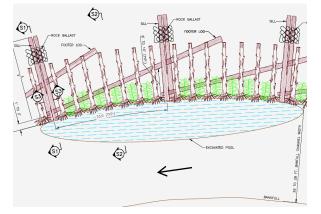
Two cells of a toe wood plan view. This configuration is intended for high-bank locations, with rock-ballasted sills embedded in the bank.
